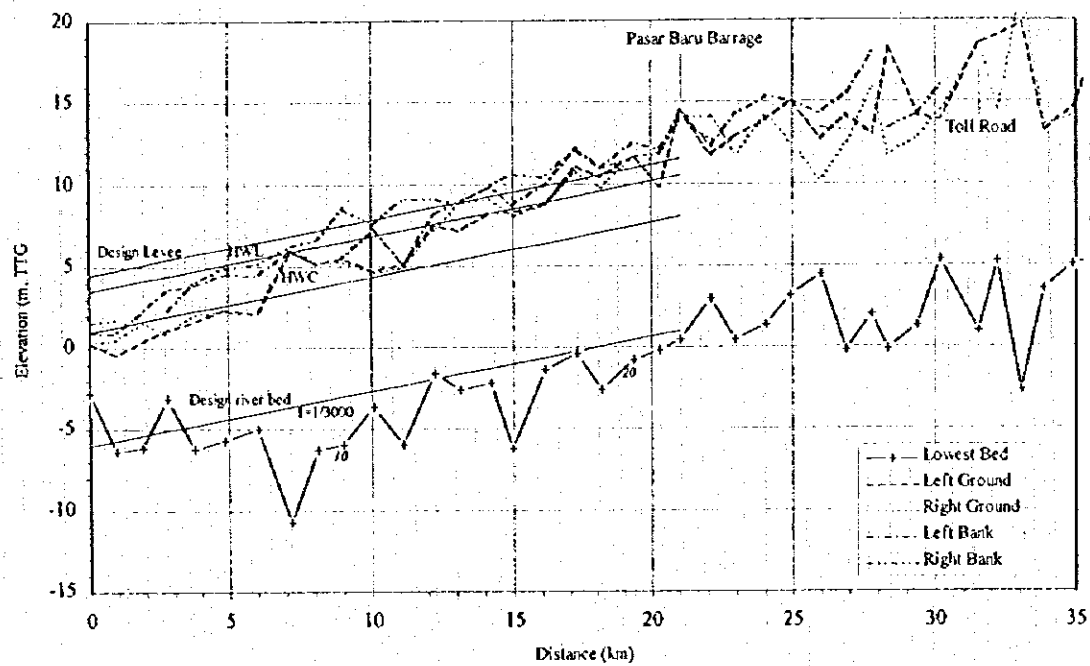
PROPOSED LONGITUDINAL PROFILE AND CROSS SECTION (3/13)
